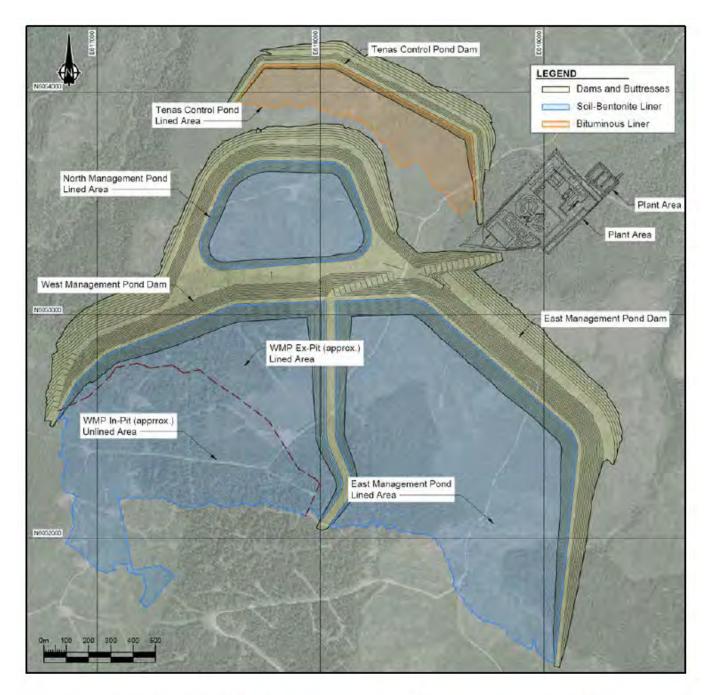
Plan view of the lined surface areas of the Tenas Control Pond and PAG management ponds at the Tenas Project
